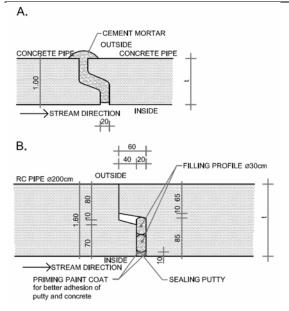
Prefabricated pipe culverts – detail of joint A. for Ø 100 cm (Ø 150 cm) B. for Ø 200 cm
